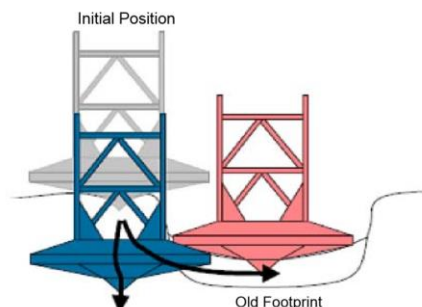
Installation Near the Footprint for Jack-up Unit (Qin and Wang ,2010)
